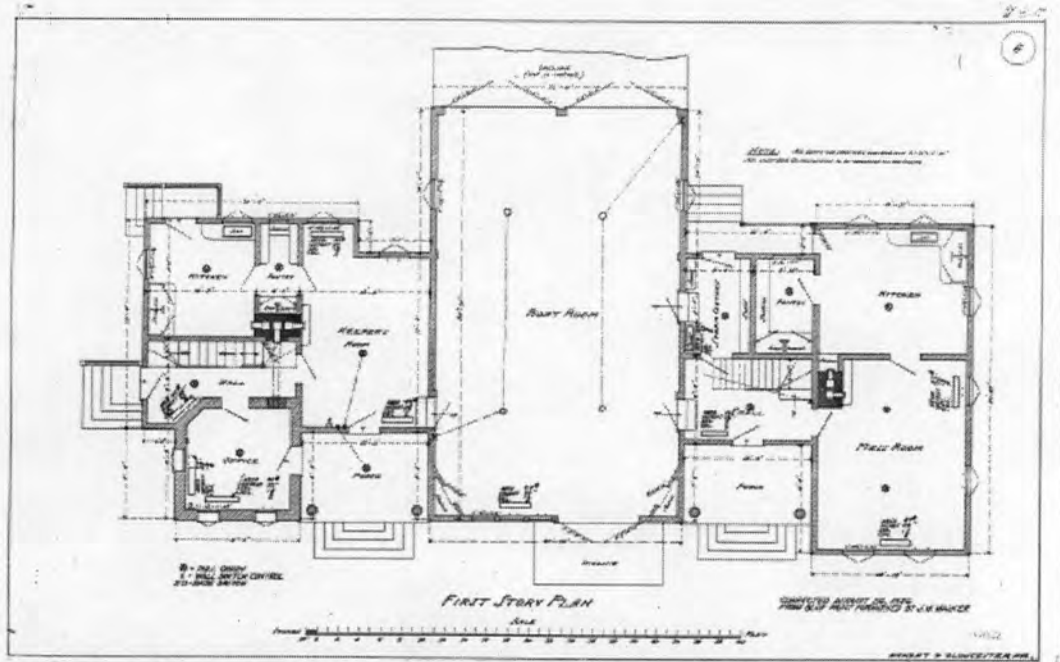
Nahant Life-Saving Station, Architect's Drawing, First Floor Plan, 1899
